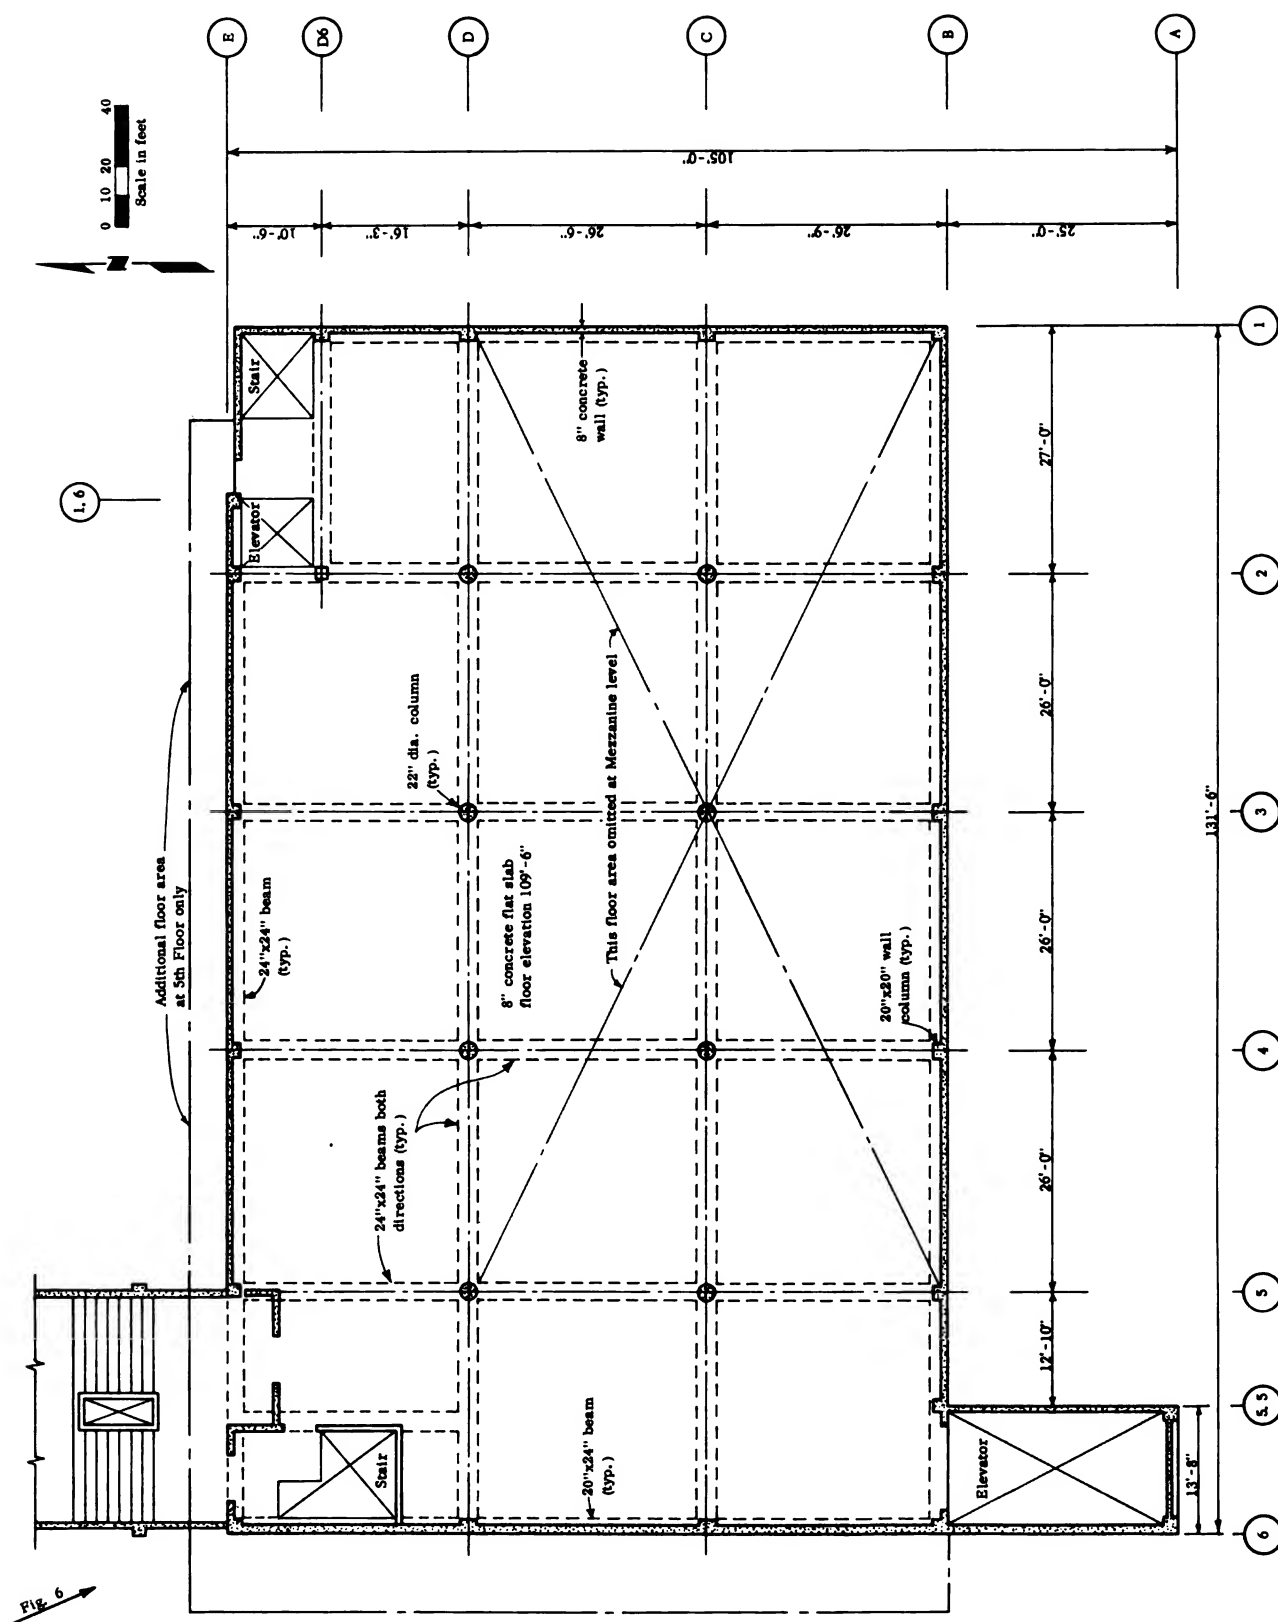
Museum for Antique Cars. Second-floor framing plan. Mezzanine, third, fourth, and fifth floors are similar.
